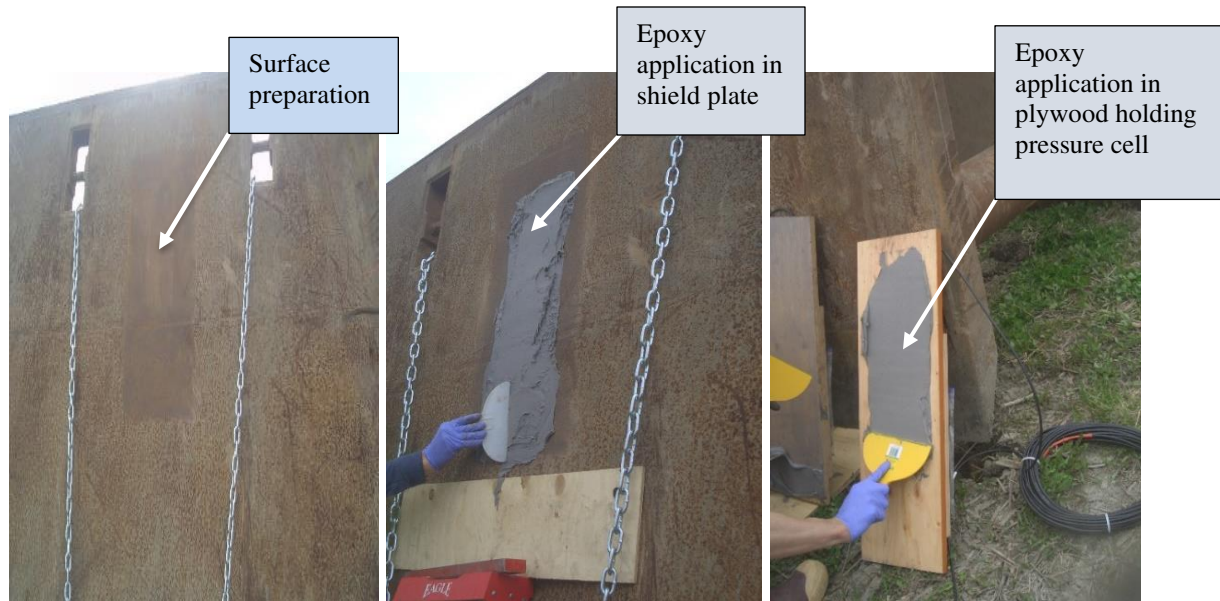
Steps to install the pressure cells on the steel wall plate of the trench box.
